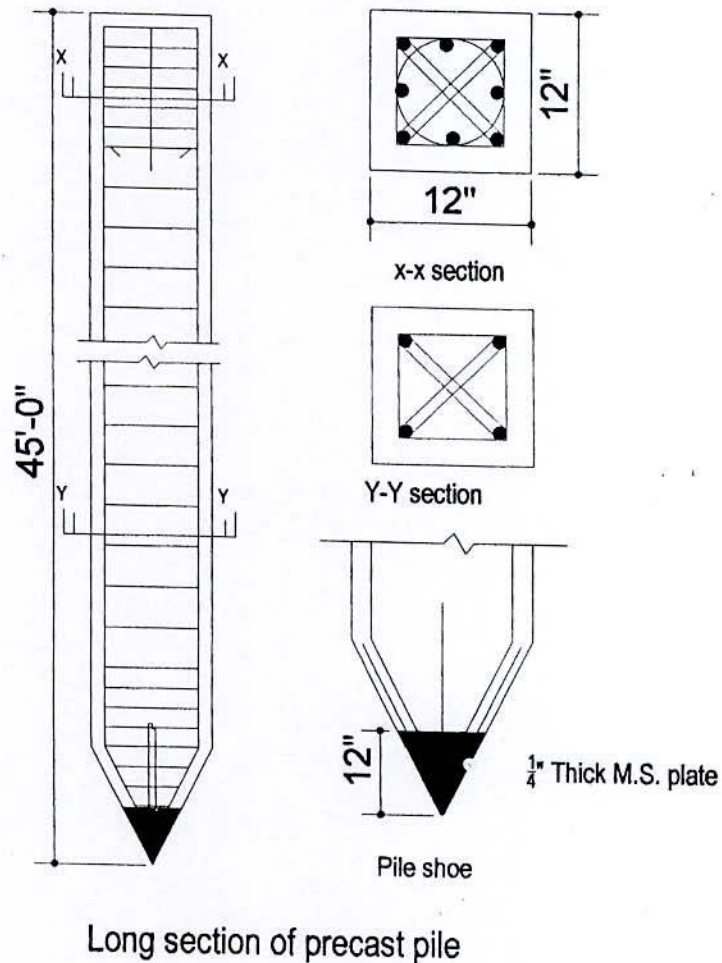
Longitudinal section of precast concrete pile (after PWD, 2006)
